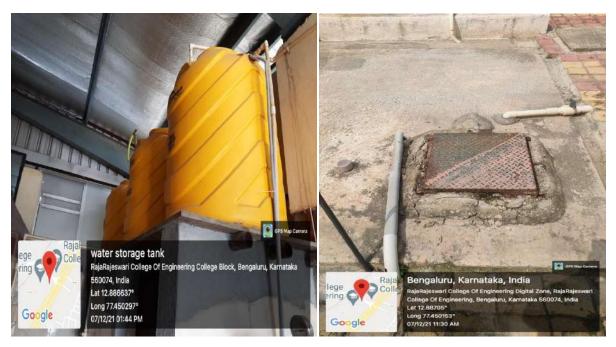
Water storage overhead tanks and Water storing sump in the campus
